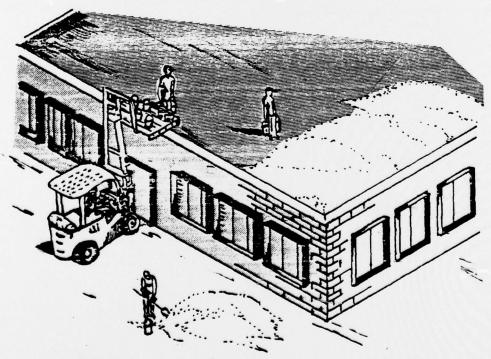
PLACING SOIL ON FLAT ROOF.
